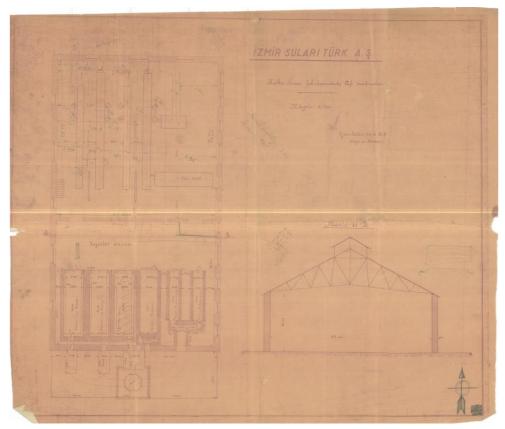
Archive document of Halkapınar Water Pump Station (Plan & Section in 1958)
